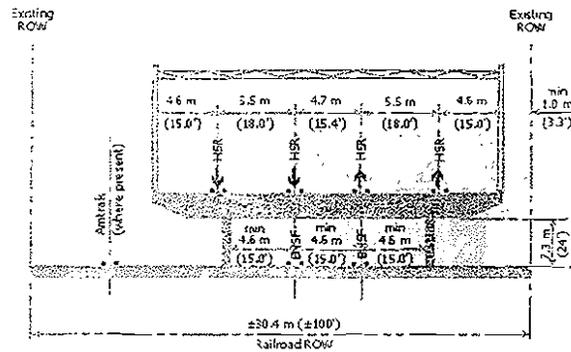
describes the station cross section envisioned by the EIS for the BNSF corridor. Its four track HSR cross section would be reduced to a two track cross section if the Truxtun station were an off-line station. It is important to note that the elevated cross section for the station (144 feet) is wider than the current 84 foot BNSF right of way. Figure 5-5 shows the envisioned cross
